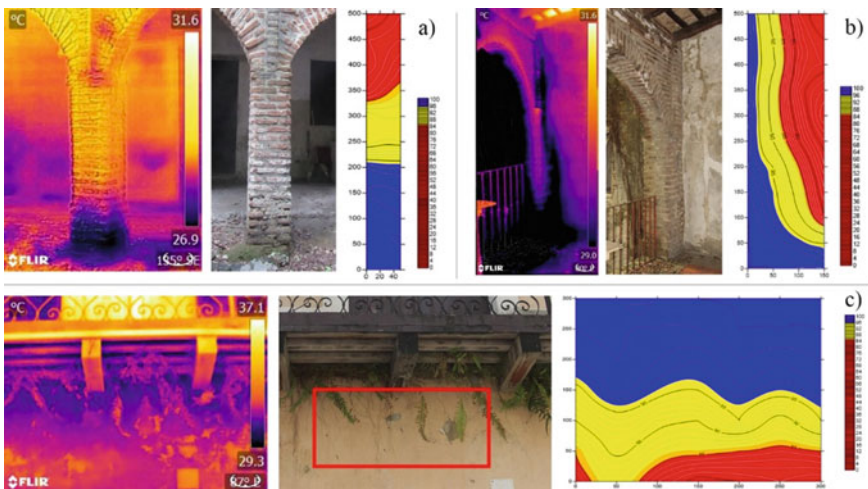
a Column first level, b corner of corridor second level and c exterior façade details
